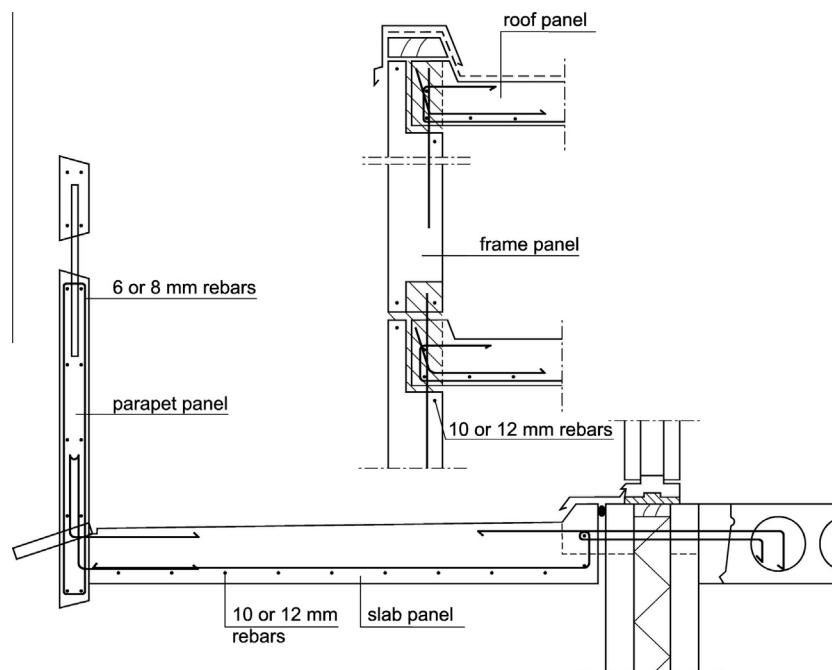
Cross-section of a typical Finnish balcony made of precast structural members [35].
